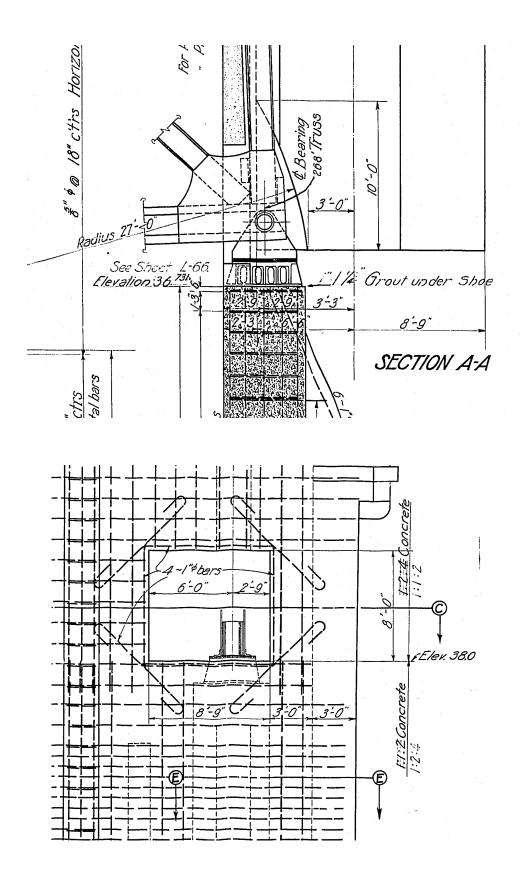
Burnside Bridge Fixed Spans Truss Fixed Bearing and Bearing Seat Width (top, side view; bottom, front view) at Piers 2 & 3
